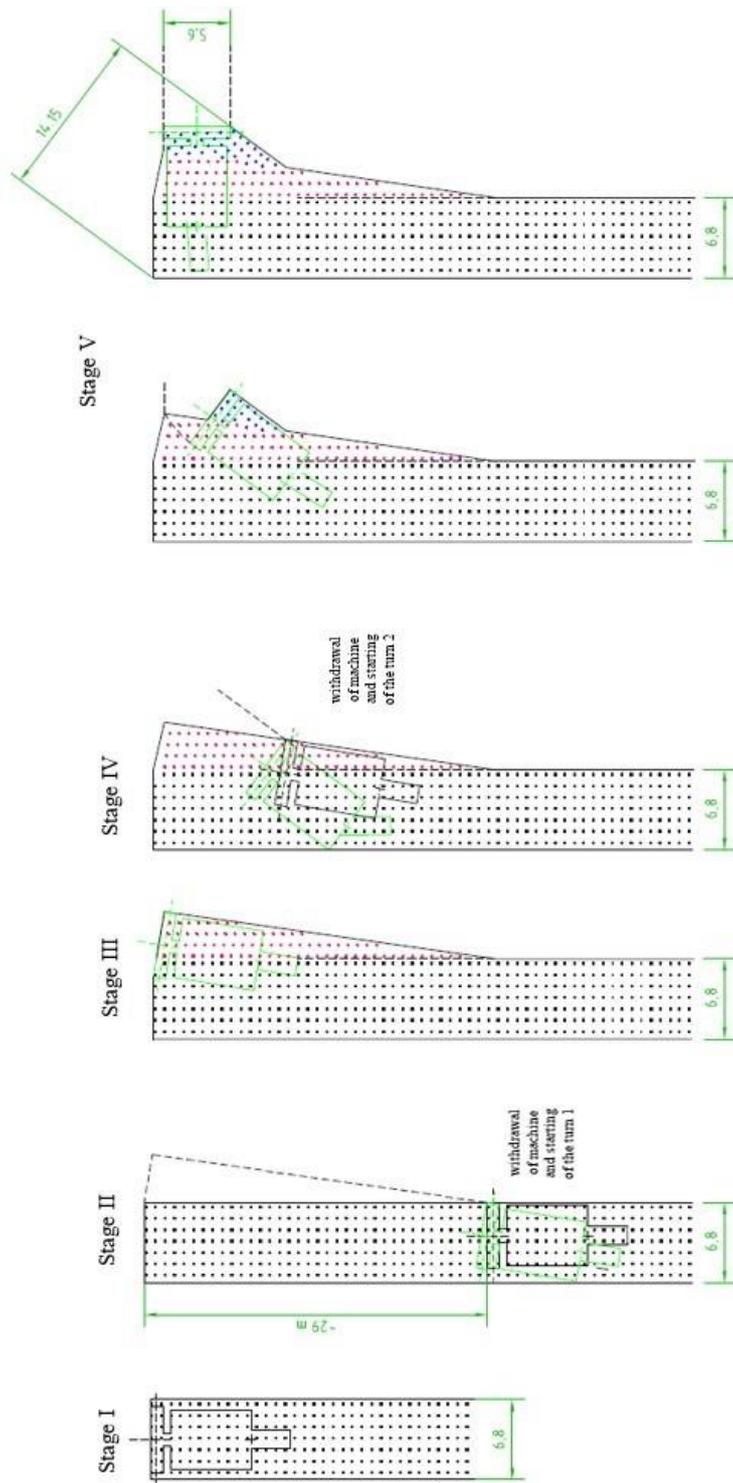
Schematic diagram of driving the bend at the angle of 90° with a long departure - 39 m and with a narrow (5.6 m) inlet to a new working
